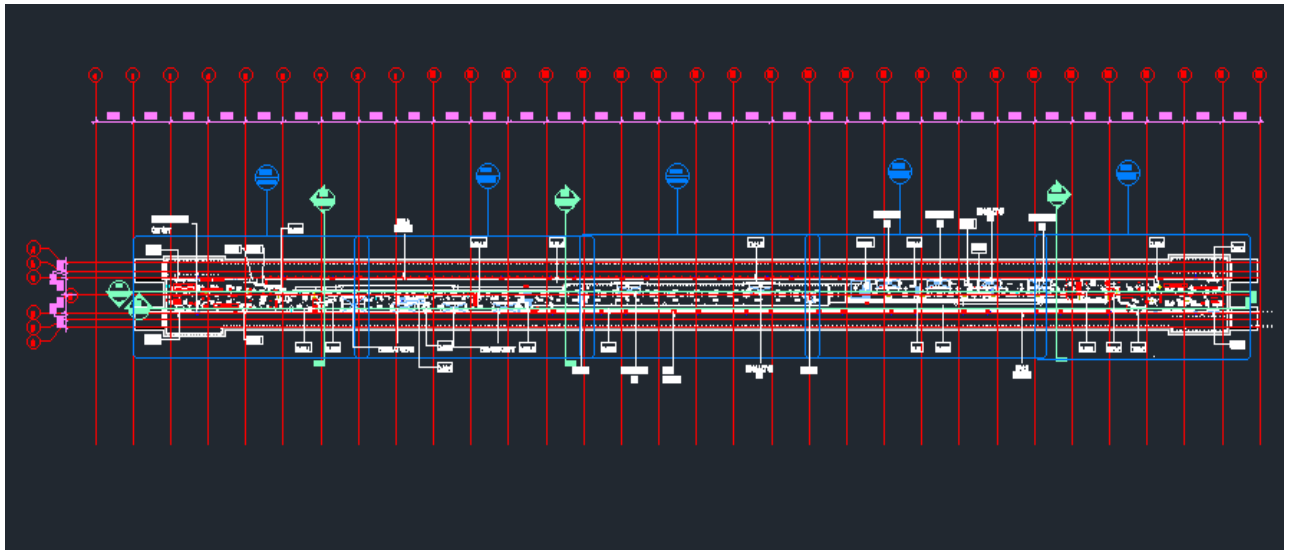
AutoCAD layout (Floor Plan) of a typical Underground Metro Undercroft Level
